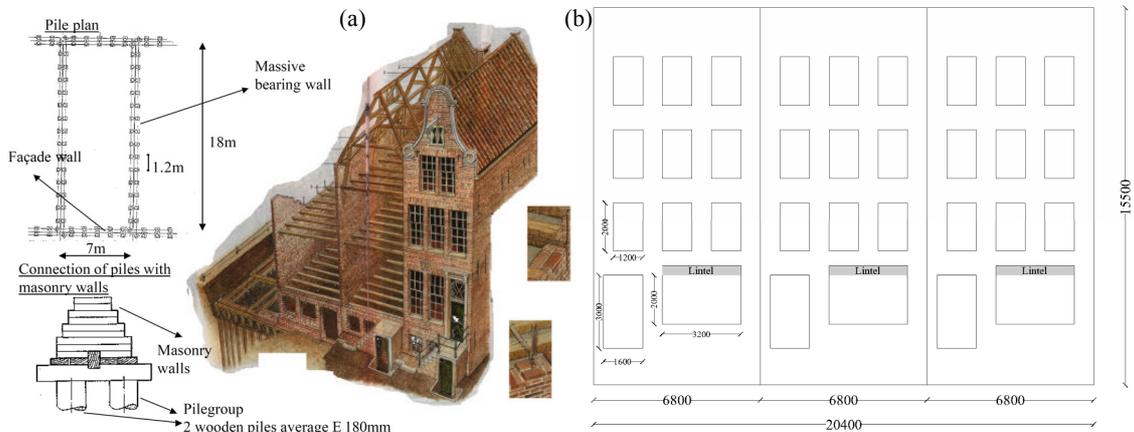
(a) An example of historical masonry buildings in Amsterdam (after Netzel and Kaalberg, 2001); (b) the selected historical masonry façade (all dimensions in mm).
